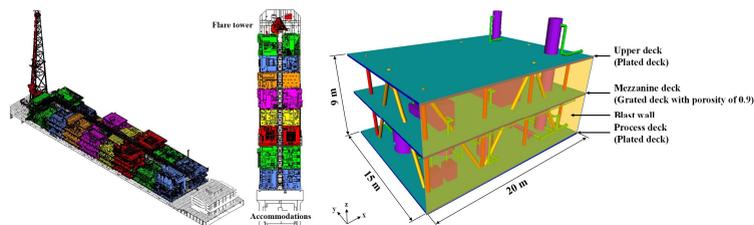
Layout of FLNG installation (left), and layout and principal dimensions of the target structure (right).
